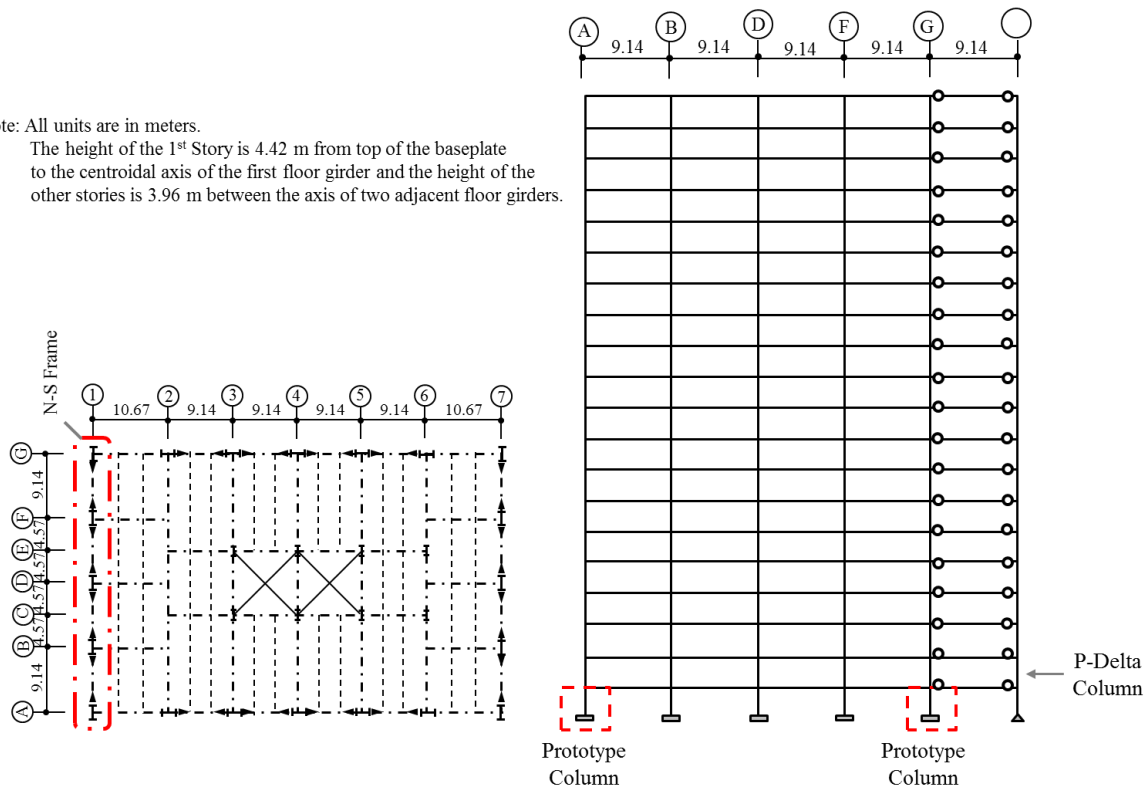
Typical floor plan and elevation of the N-S moment-resisting frame structure.
